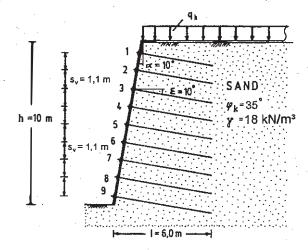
Design example for a near vertical nailed wall in sand charged with a live load
